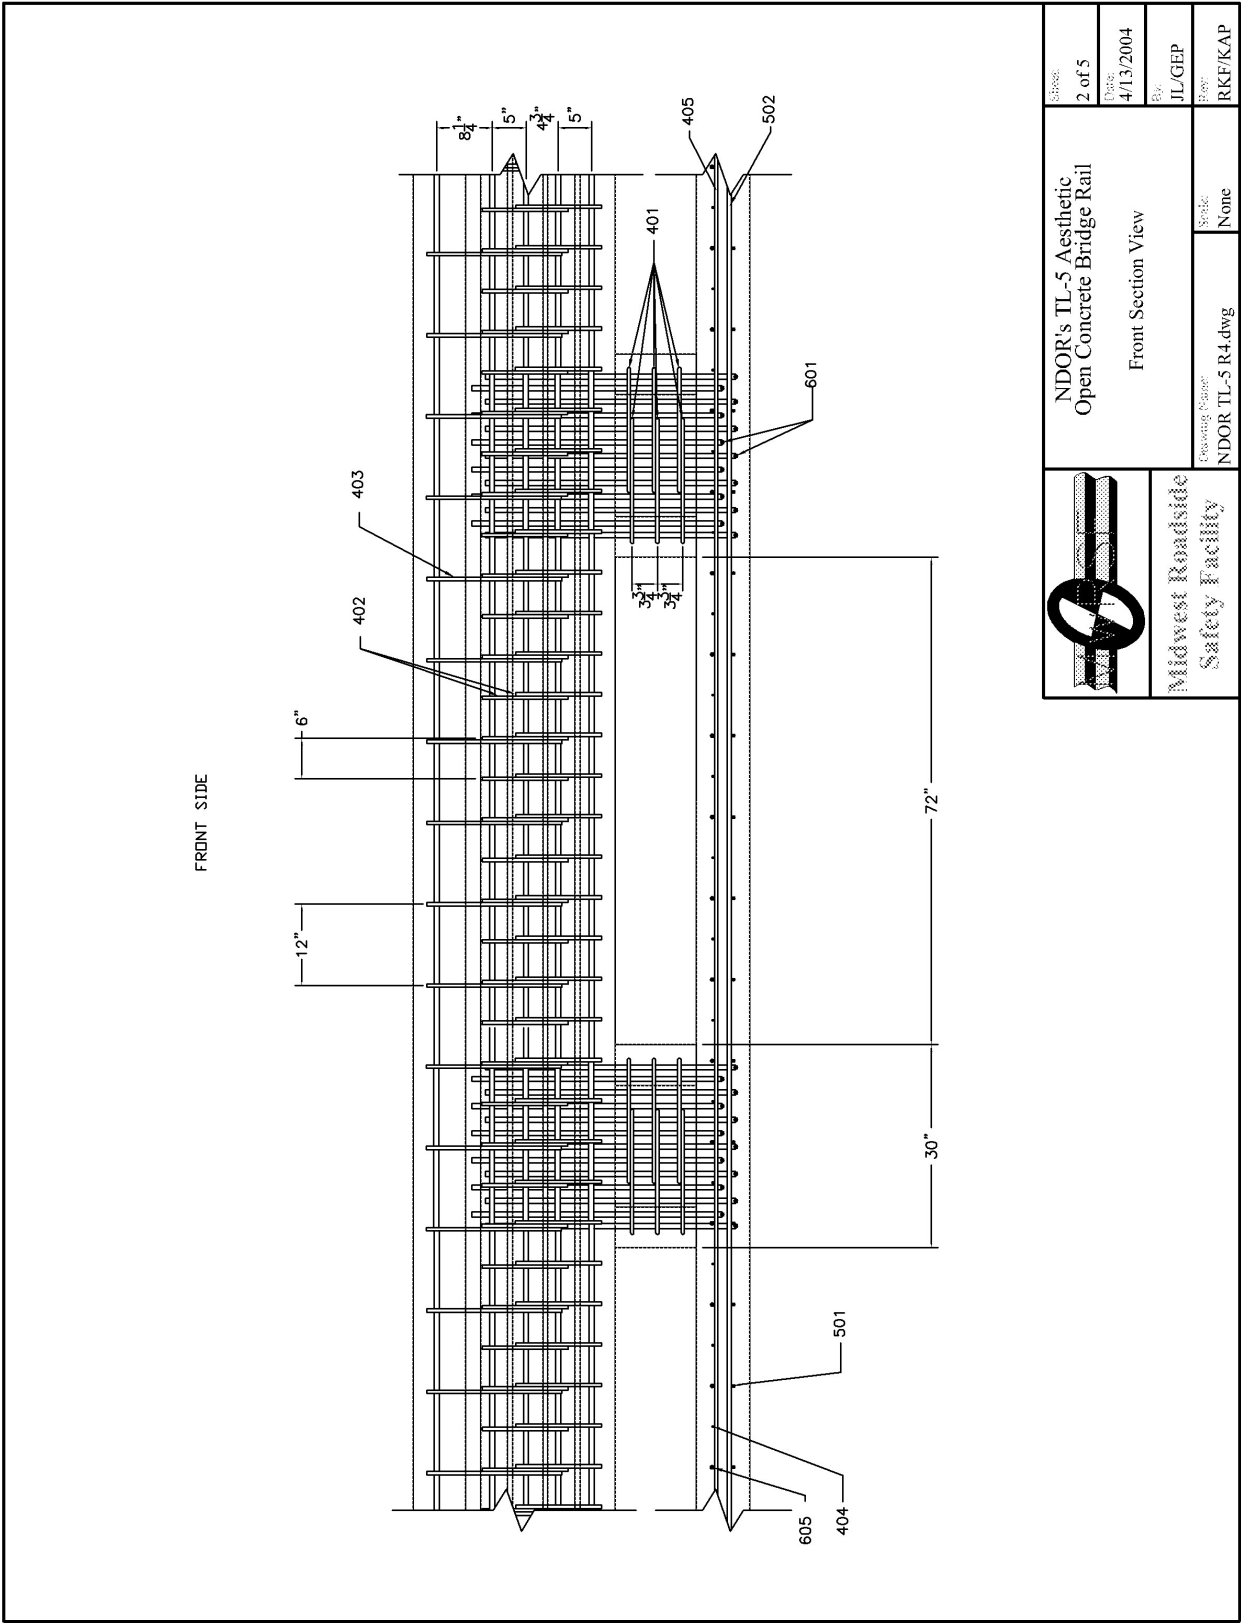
NDOR's TL-5 Aesthetic Open Concrete Bridge Rail Design Details (English)
